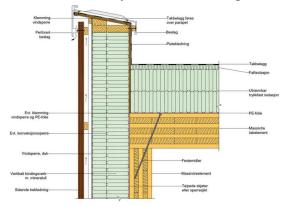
Principal detail parapet at unventilated compact roof and CLT-Element [6]
